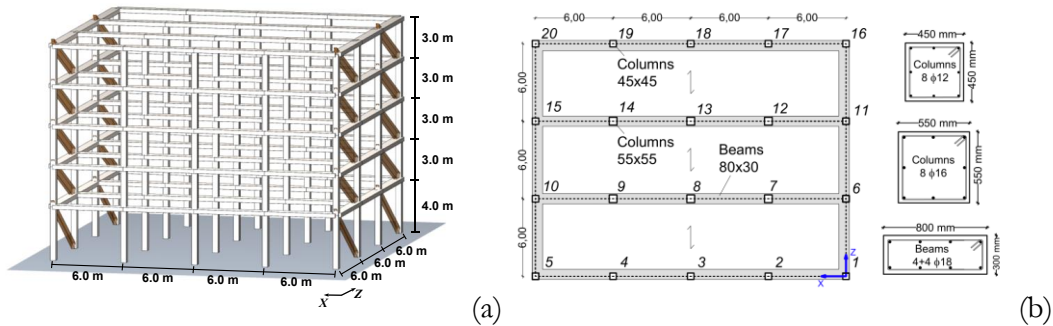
Geometrical dimensions of the reference structural model: (a) 3D frame view; (b) Plan view and RC element cross-section dimensions.
